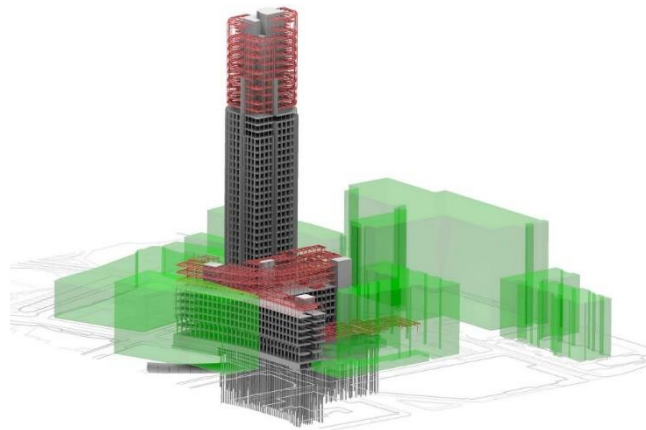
3D model of the Southbank Tower extension, showing the original structure (grey), additional steelwork (red) and surrounding buildings (green). (© AKT II)
